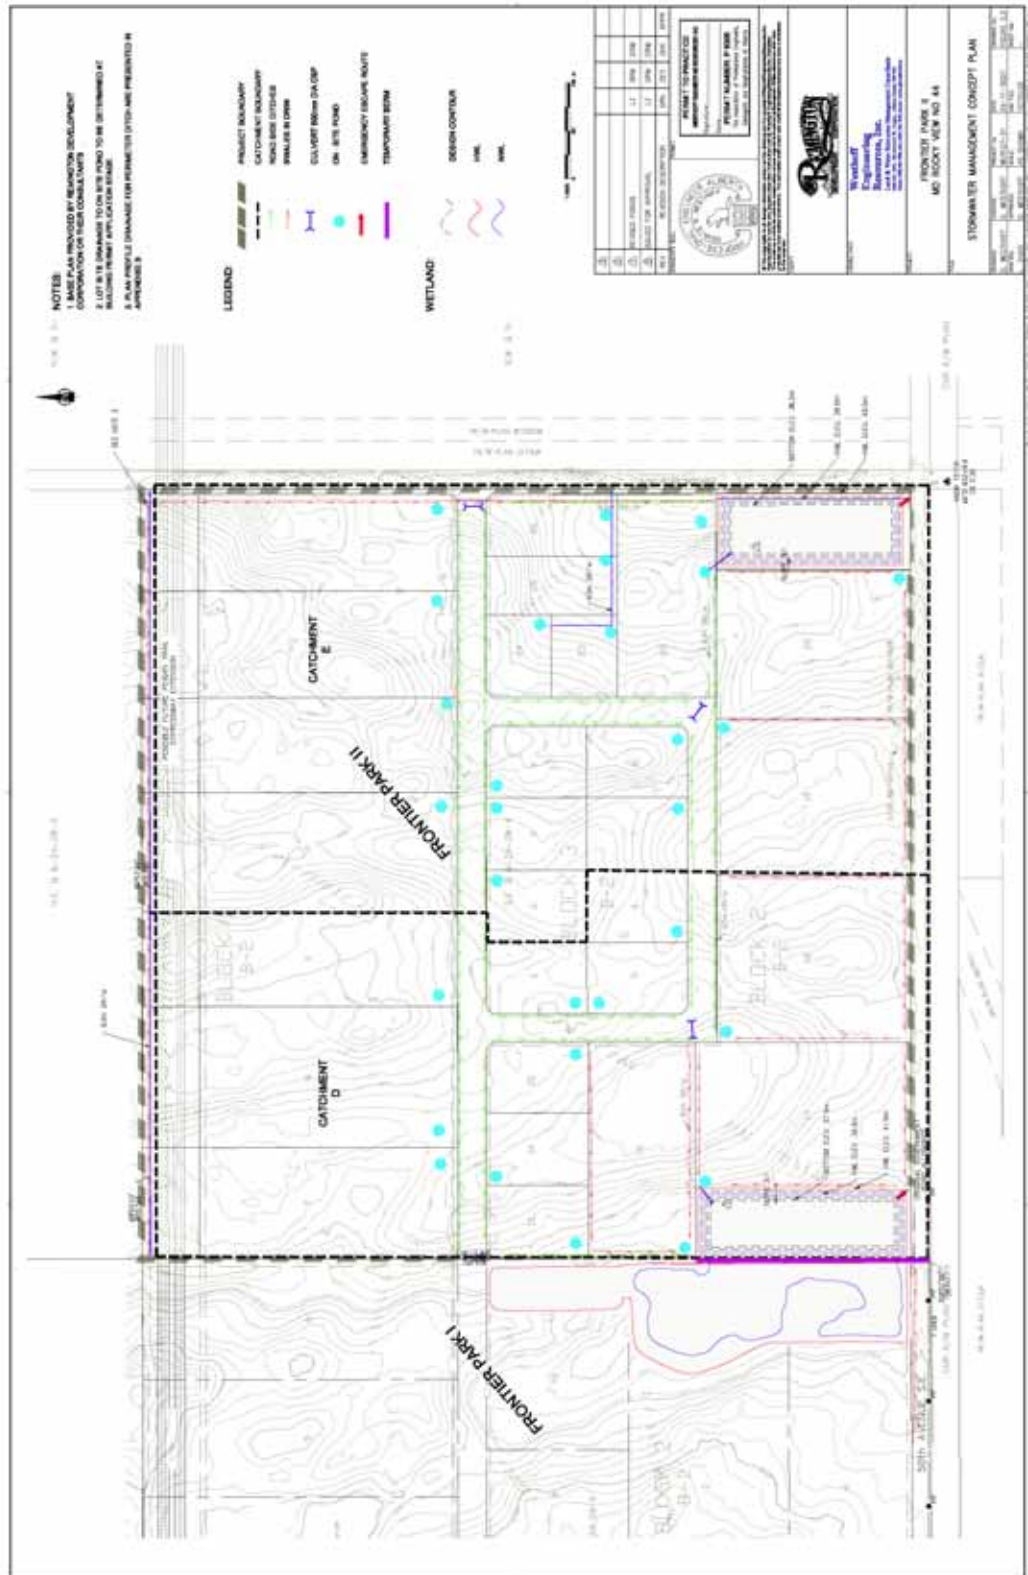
STORMWATER MANAGEMENT CONCEPT PLAN
